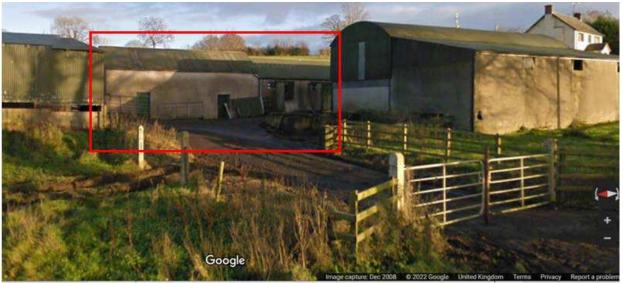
Google image of building as it stands today on site captured in December 2008. The surrounding agricultural building have since been removed and no. 92 Lisaclare Rd the associated dwelling see above to the northeast corner is in the process of being replaced under a recent planning permission.
